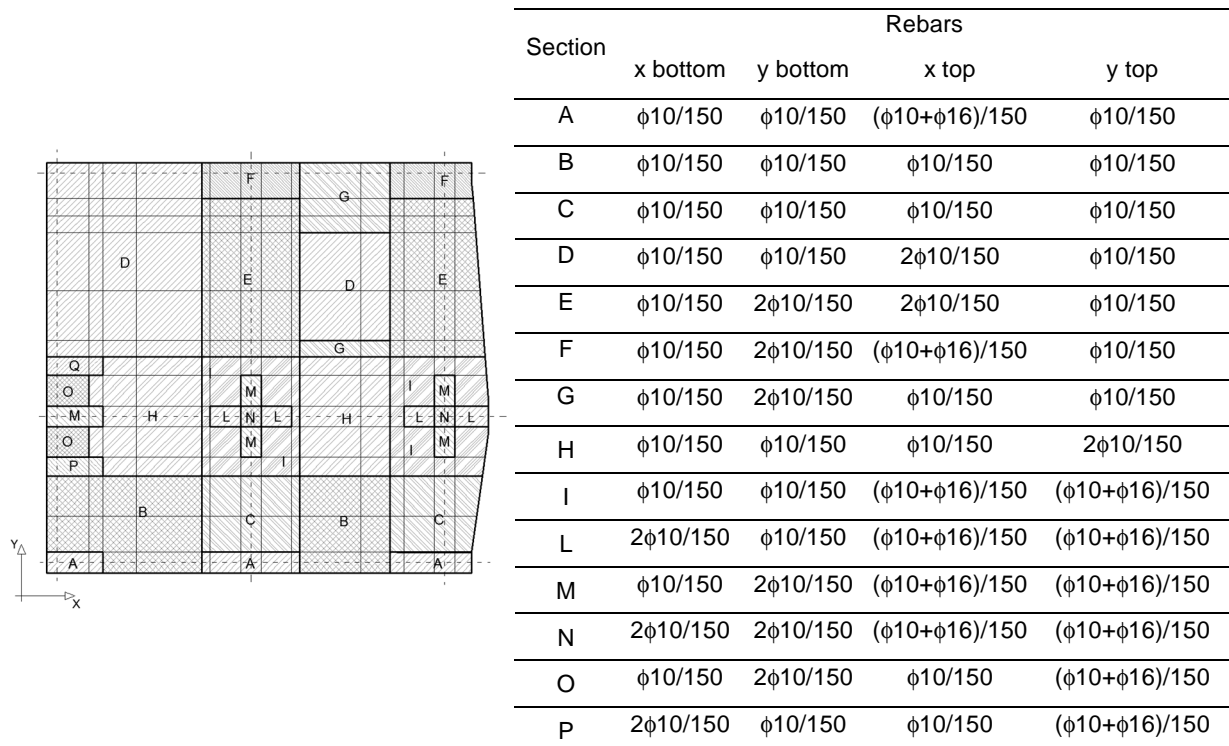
'Asymmetric' structure. (a) Concrete slab partitions; (b) slab section properties (measures in mm)
